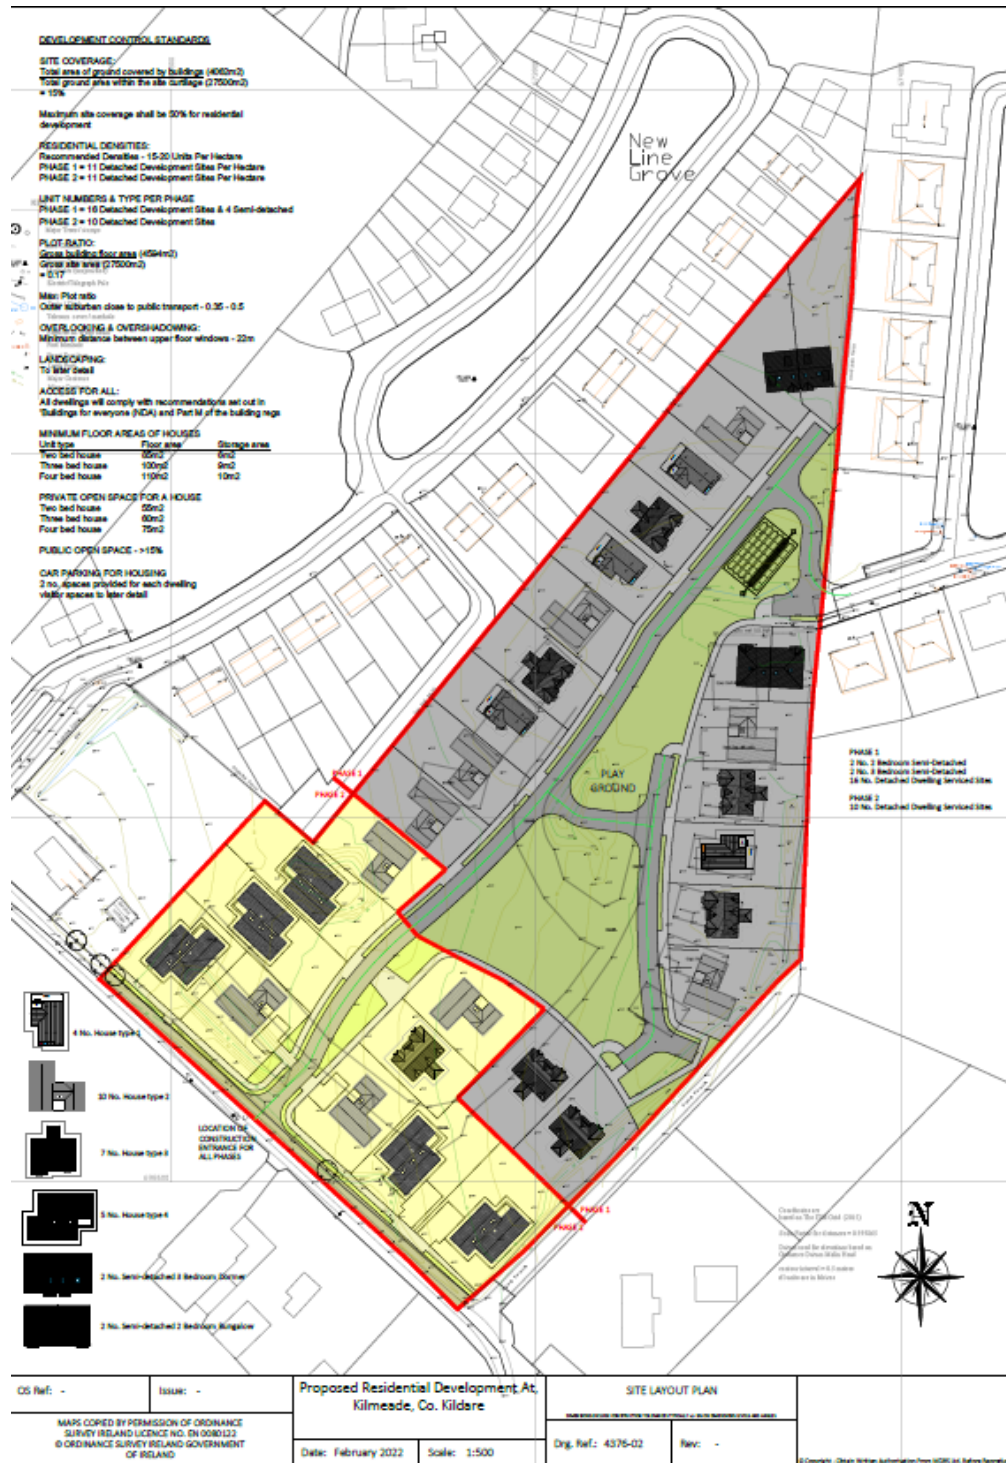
Proposed layout for 30 no. dwellings on the subject lands.
